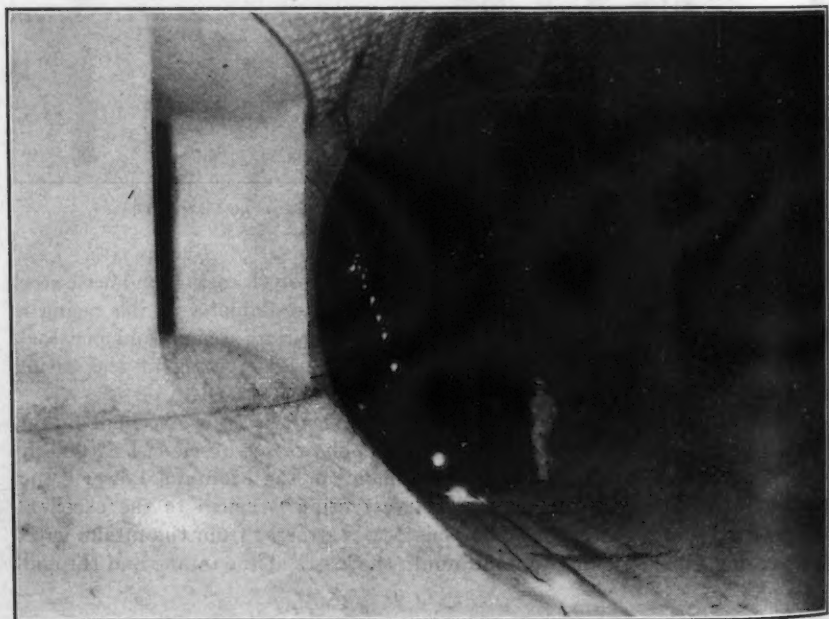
INTERIOR VIEW OF STAY-RING, CASING, AND PENSTOCK, NORRIS DAM PLANT
